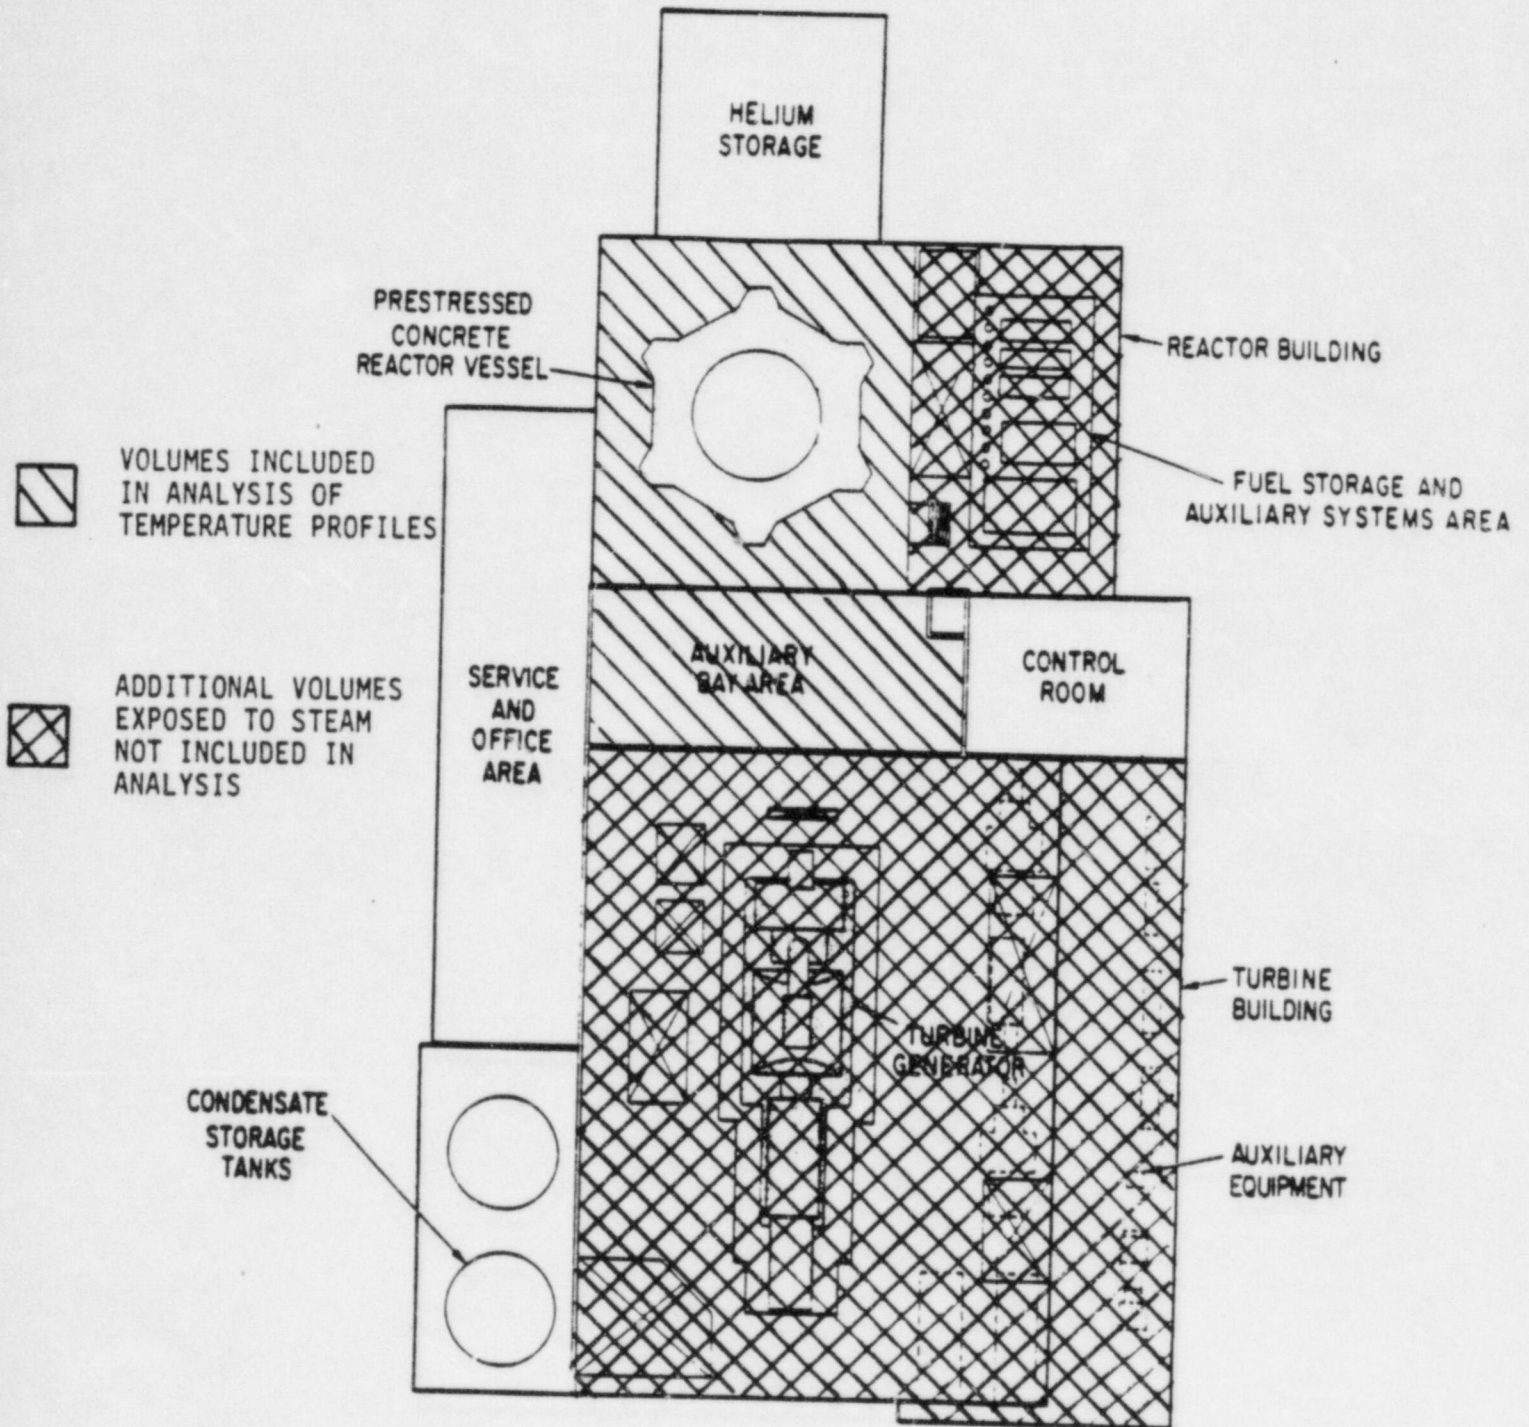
Plan View of Reactor Building and Turbine Building
